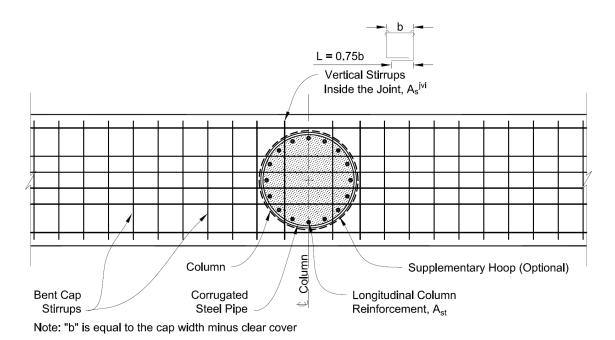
Cap Pocket Joint Shear Reinforcement Details (Plan)—SDC B
